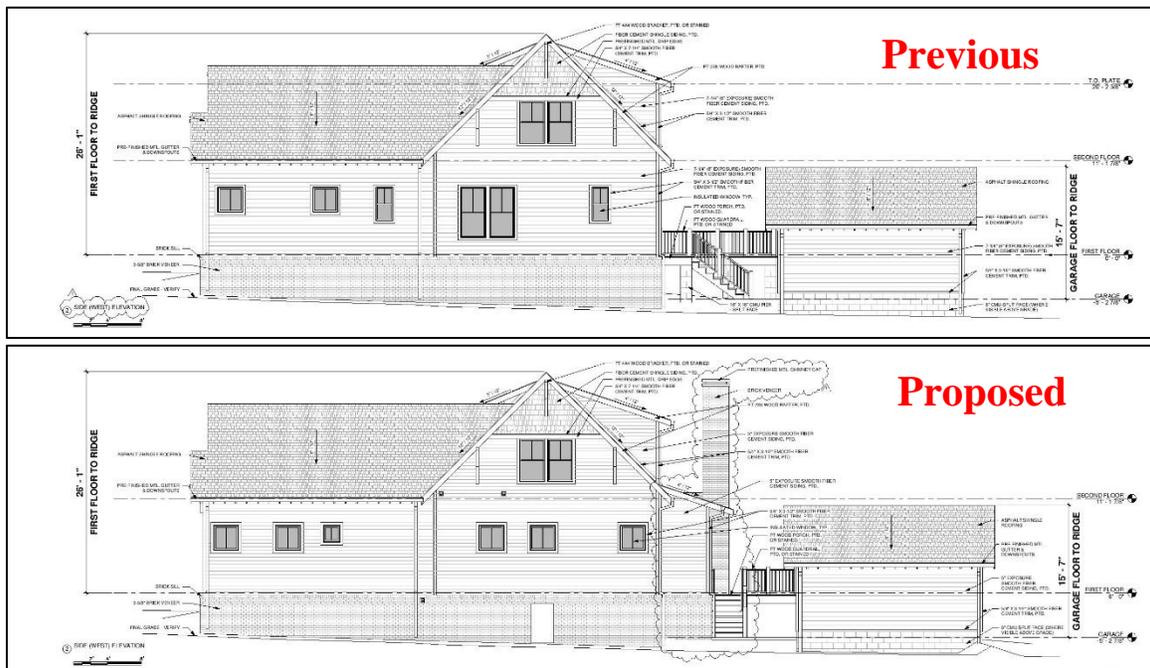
(above) shows the previously approved right façade and Figure 7 (below) shows the proposed right façade. Note that the changes to the window openings and gable details were approved by MHZC in December.
